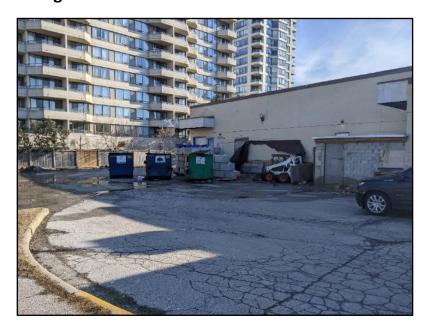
Side of strip mall at 60 Dundas Street East, paved asphalt parking, facing southeast.
